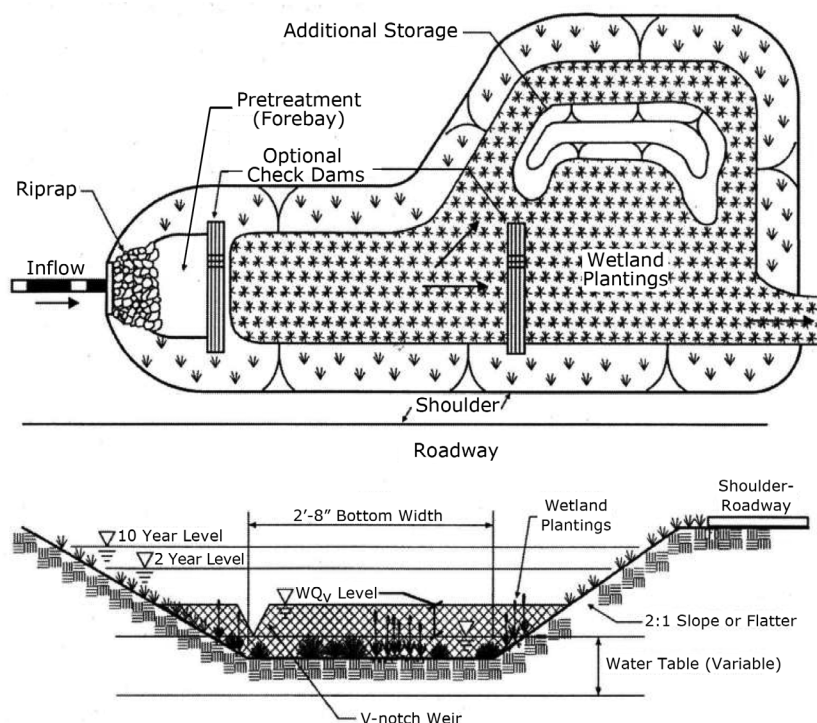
Typical wet swale design details; (top) plan view, (bottom) profile view.
